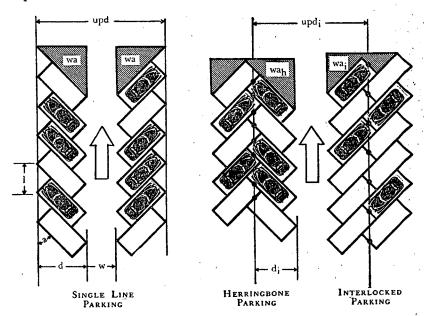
Changing the angle of parking affects the dimensions of a parking layout.
